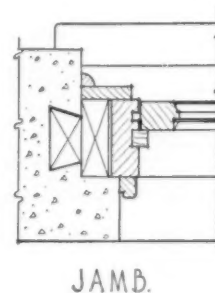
DETAIL "E" SUGGESTED TREATMENT FOR CONCRETE WALLS
